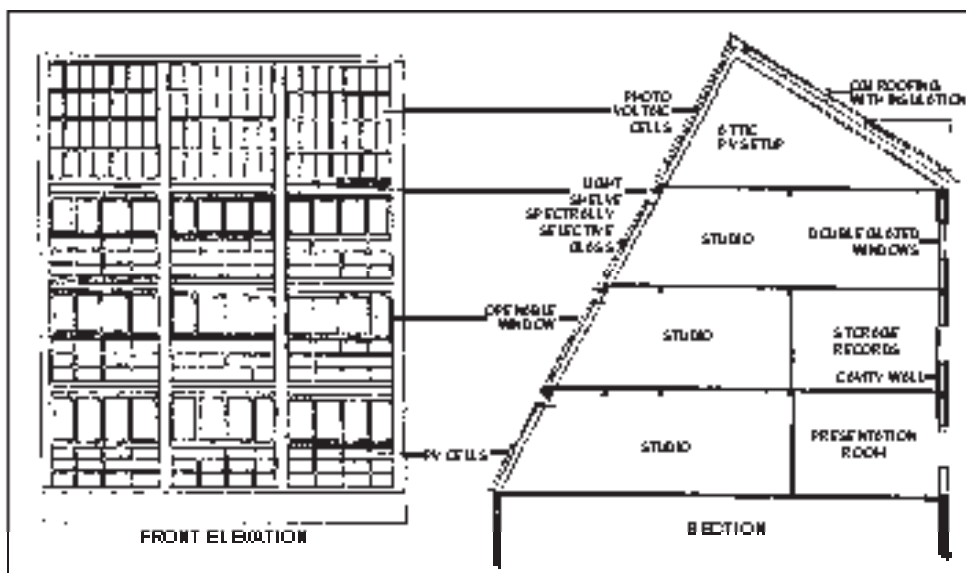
Section and Elevation of an Alternate Design for Nirman Bhawan at Shimla
